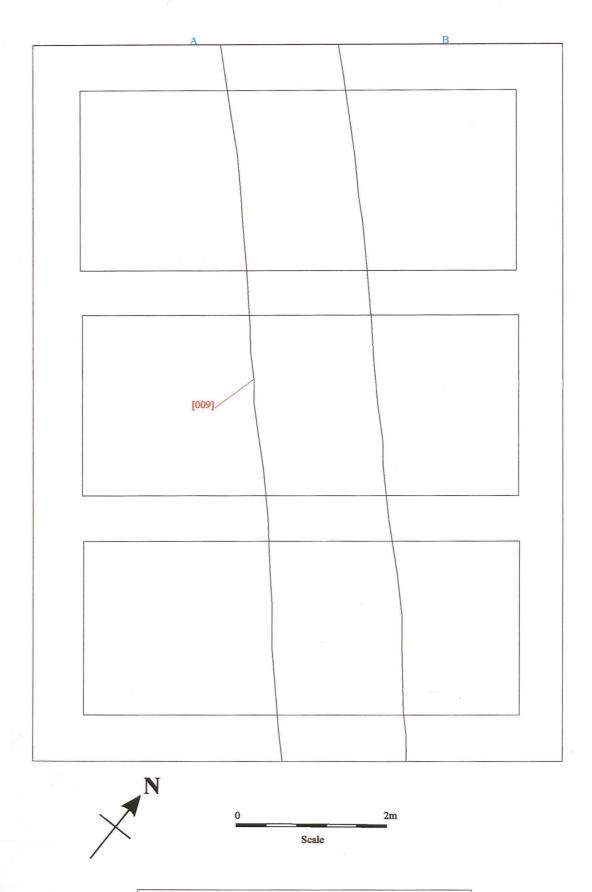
Plan of garage foundation showing location of section and former evaluation trench [009]. 1:50
